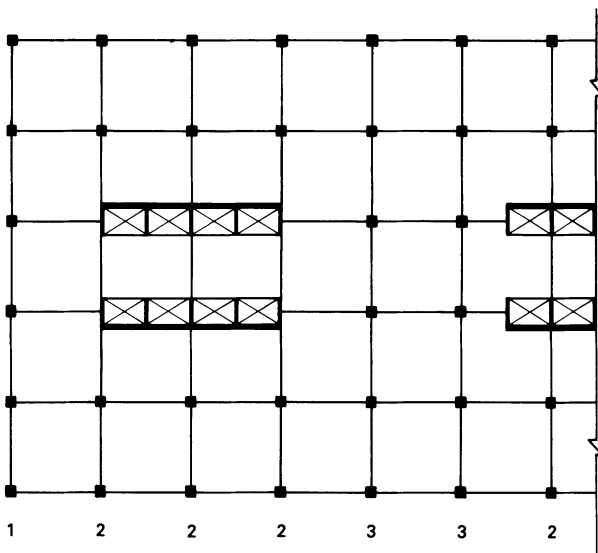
Typical symmetrical floor plan (shown half) indicating building frames and shear walls.
